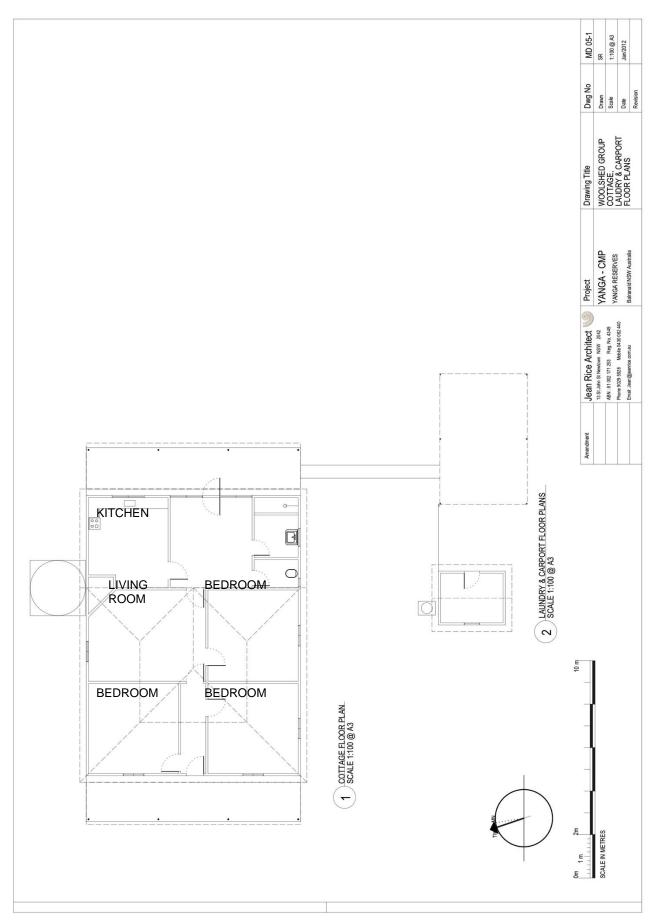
Woolshed Group Woolshed Cottage floor plan. Jean Rice Architect, site assessment 2009.
